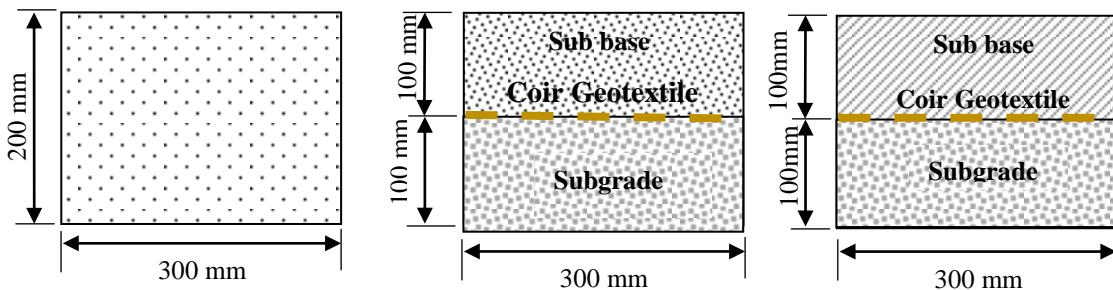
Reinforced and unreinforced pavement model layer at the sub-base layer I
